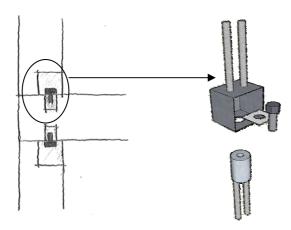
Sketch of floor-to-wall connection. Visualised when cast in and the device only.
